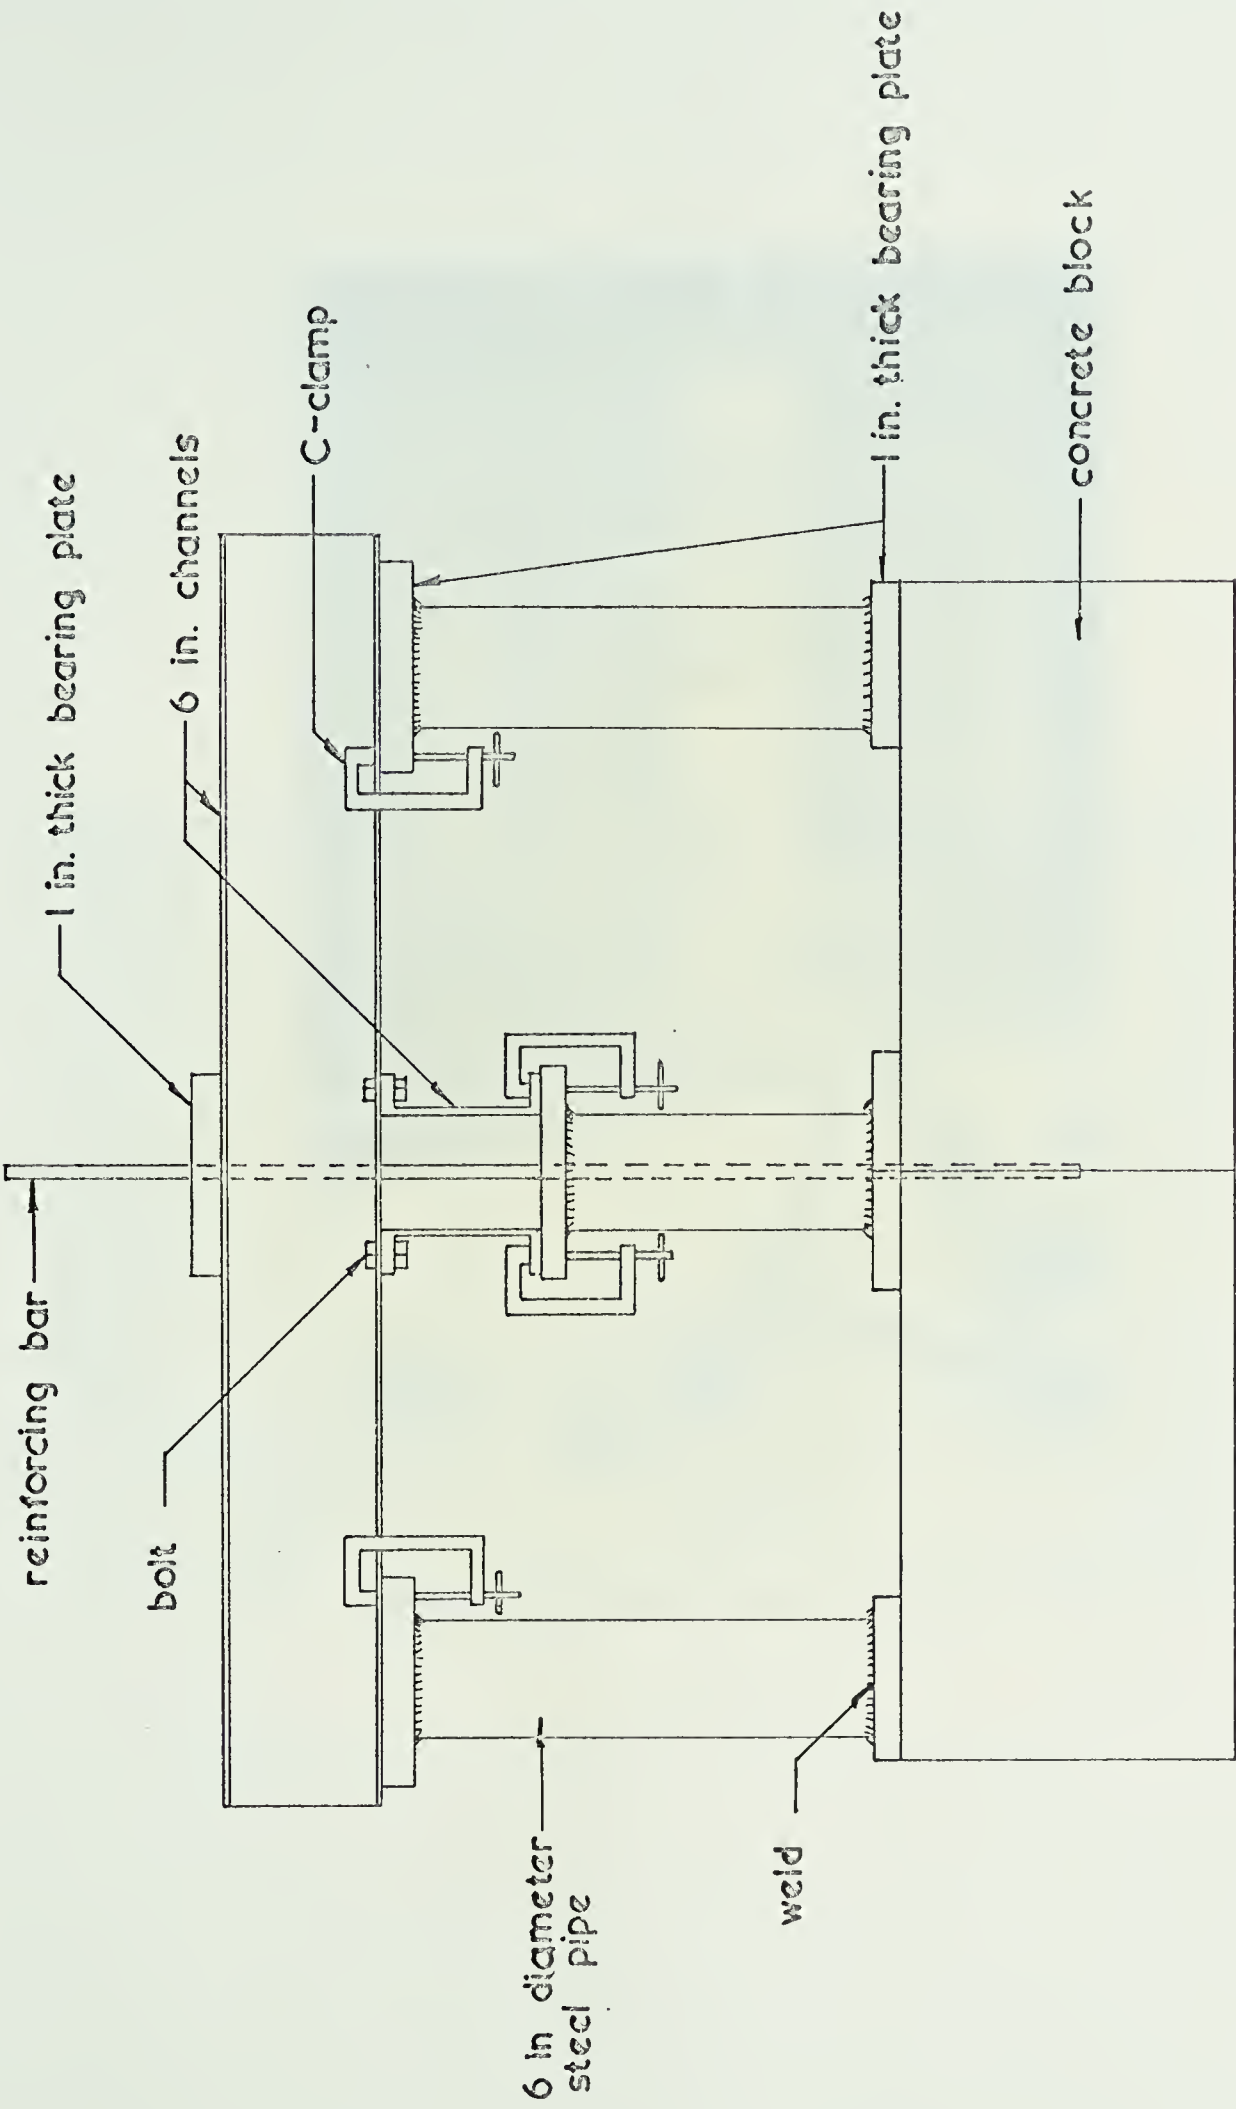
BLOCK PULL-OUT TESTING APPARATUS
